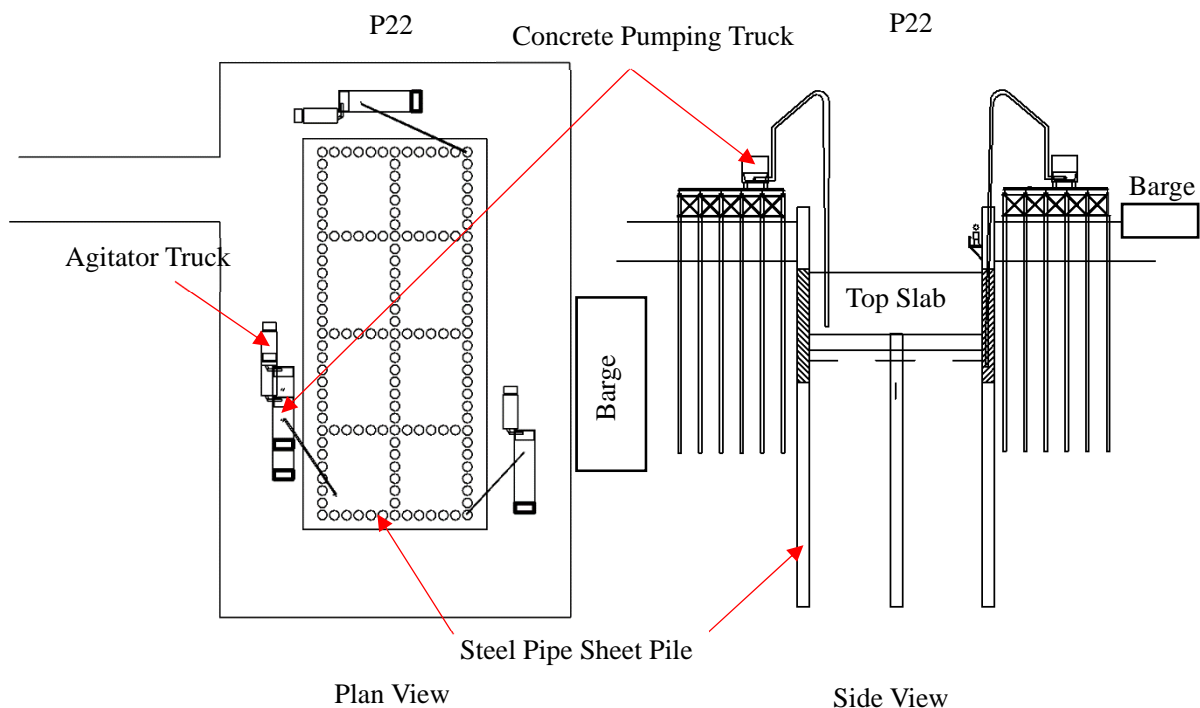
Reference Drawing for Placement of Top Slab Concrete inside the SPSP
